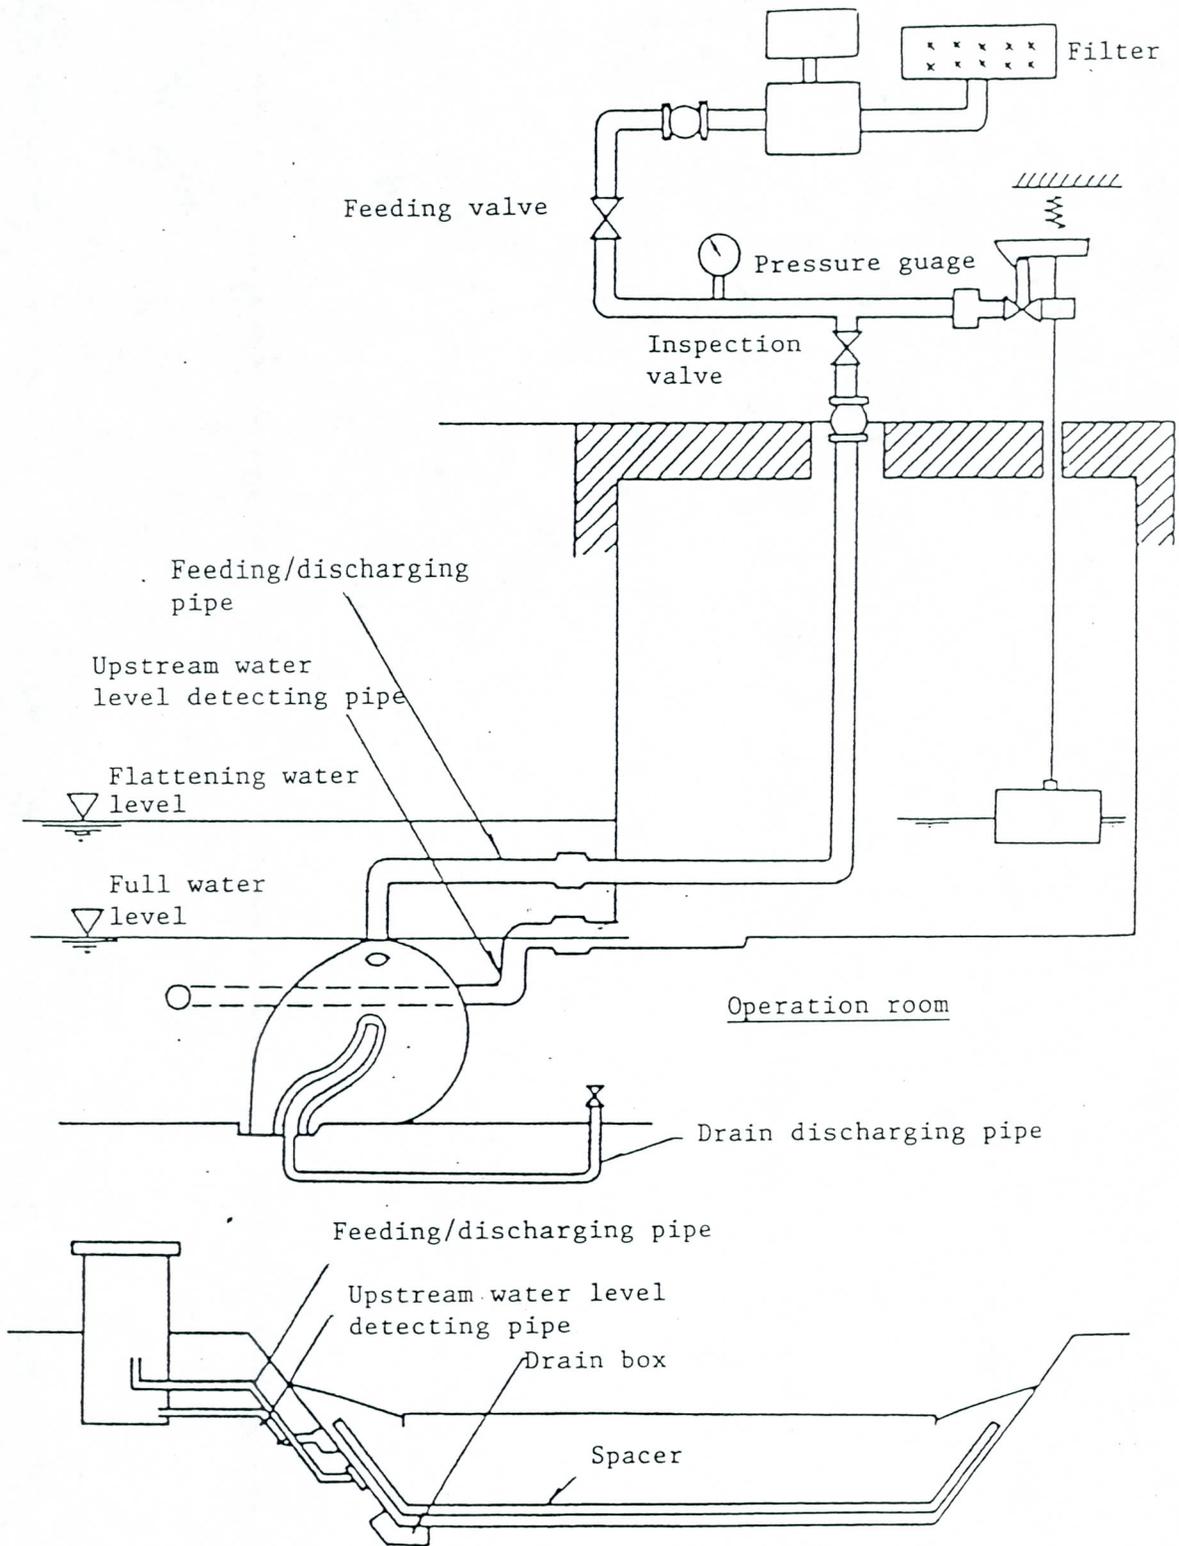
Example of installation of feeding/discharging piping (Air type - 2)
